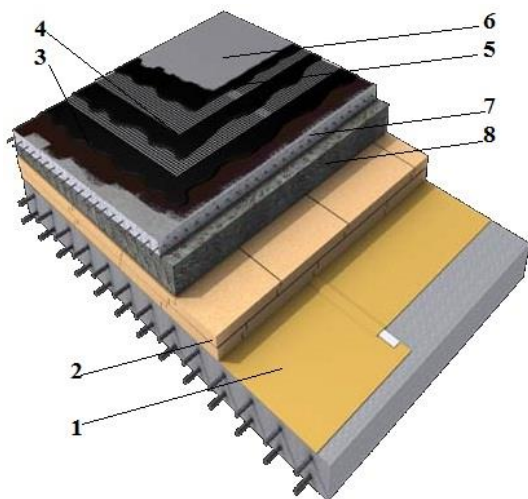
Laying PVC membrane in sloping made of V-shaped slabs
